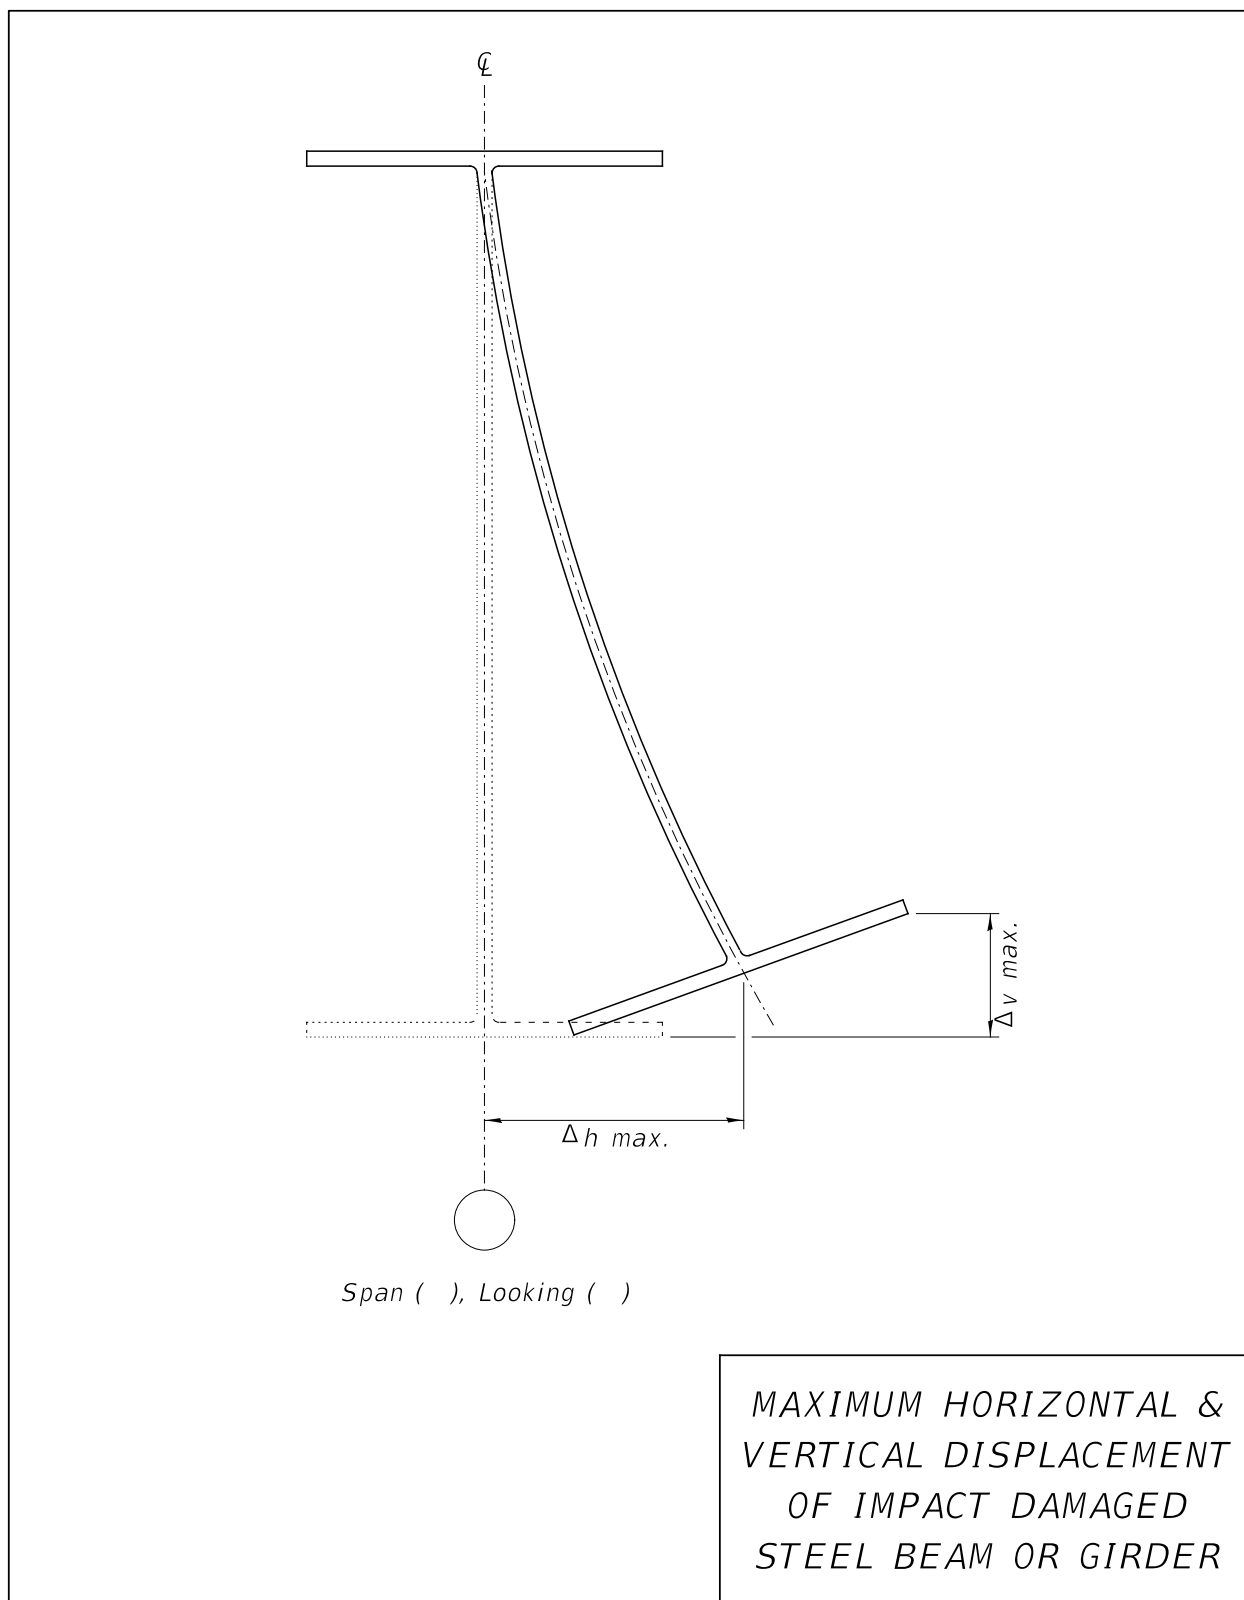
Max. Horiz. & Vert. Displacement of Impact-Damaged Steel Beam / Girder
